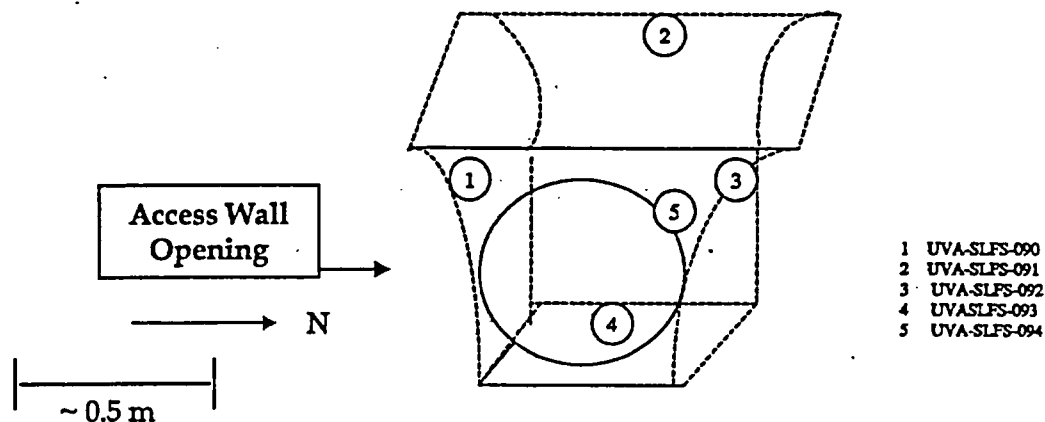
Excavation of Pool Fill at Demineralizer Room Wall
